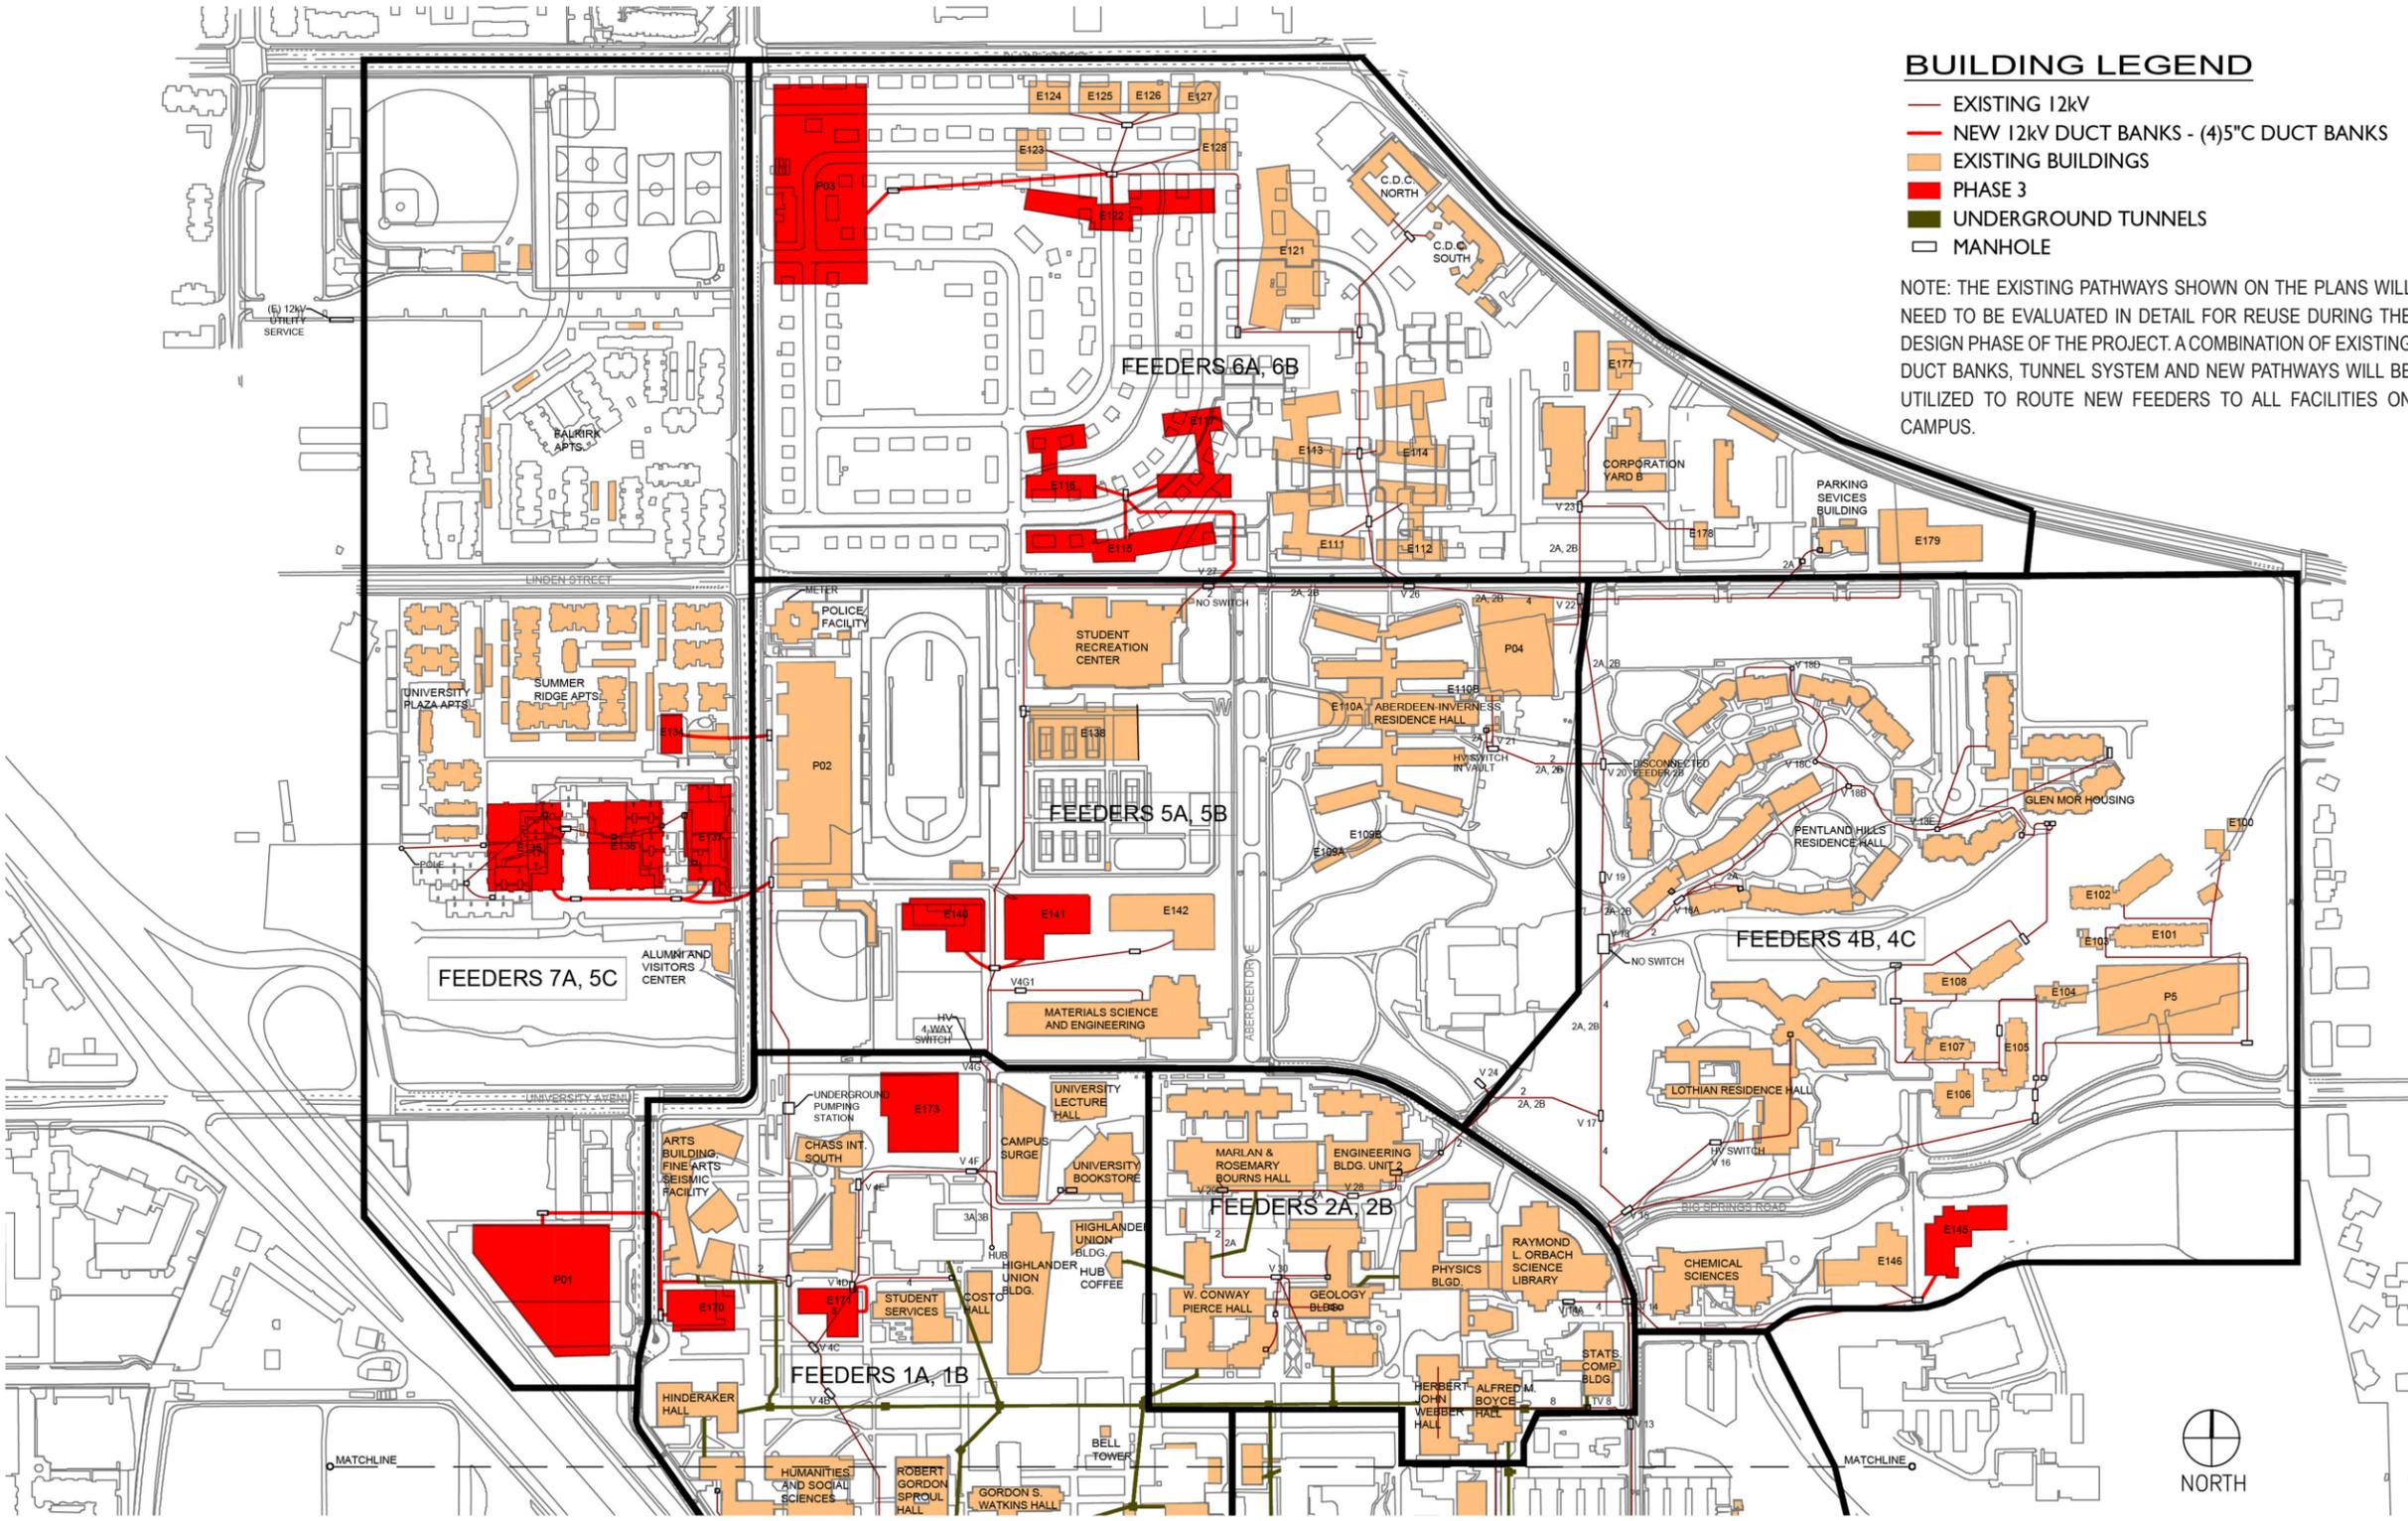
Phase 3 Buildings Electrical Site Plan–North
